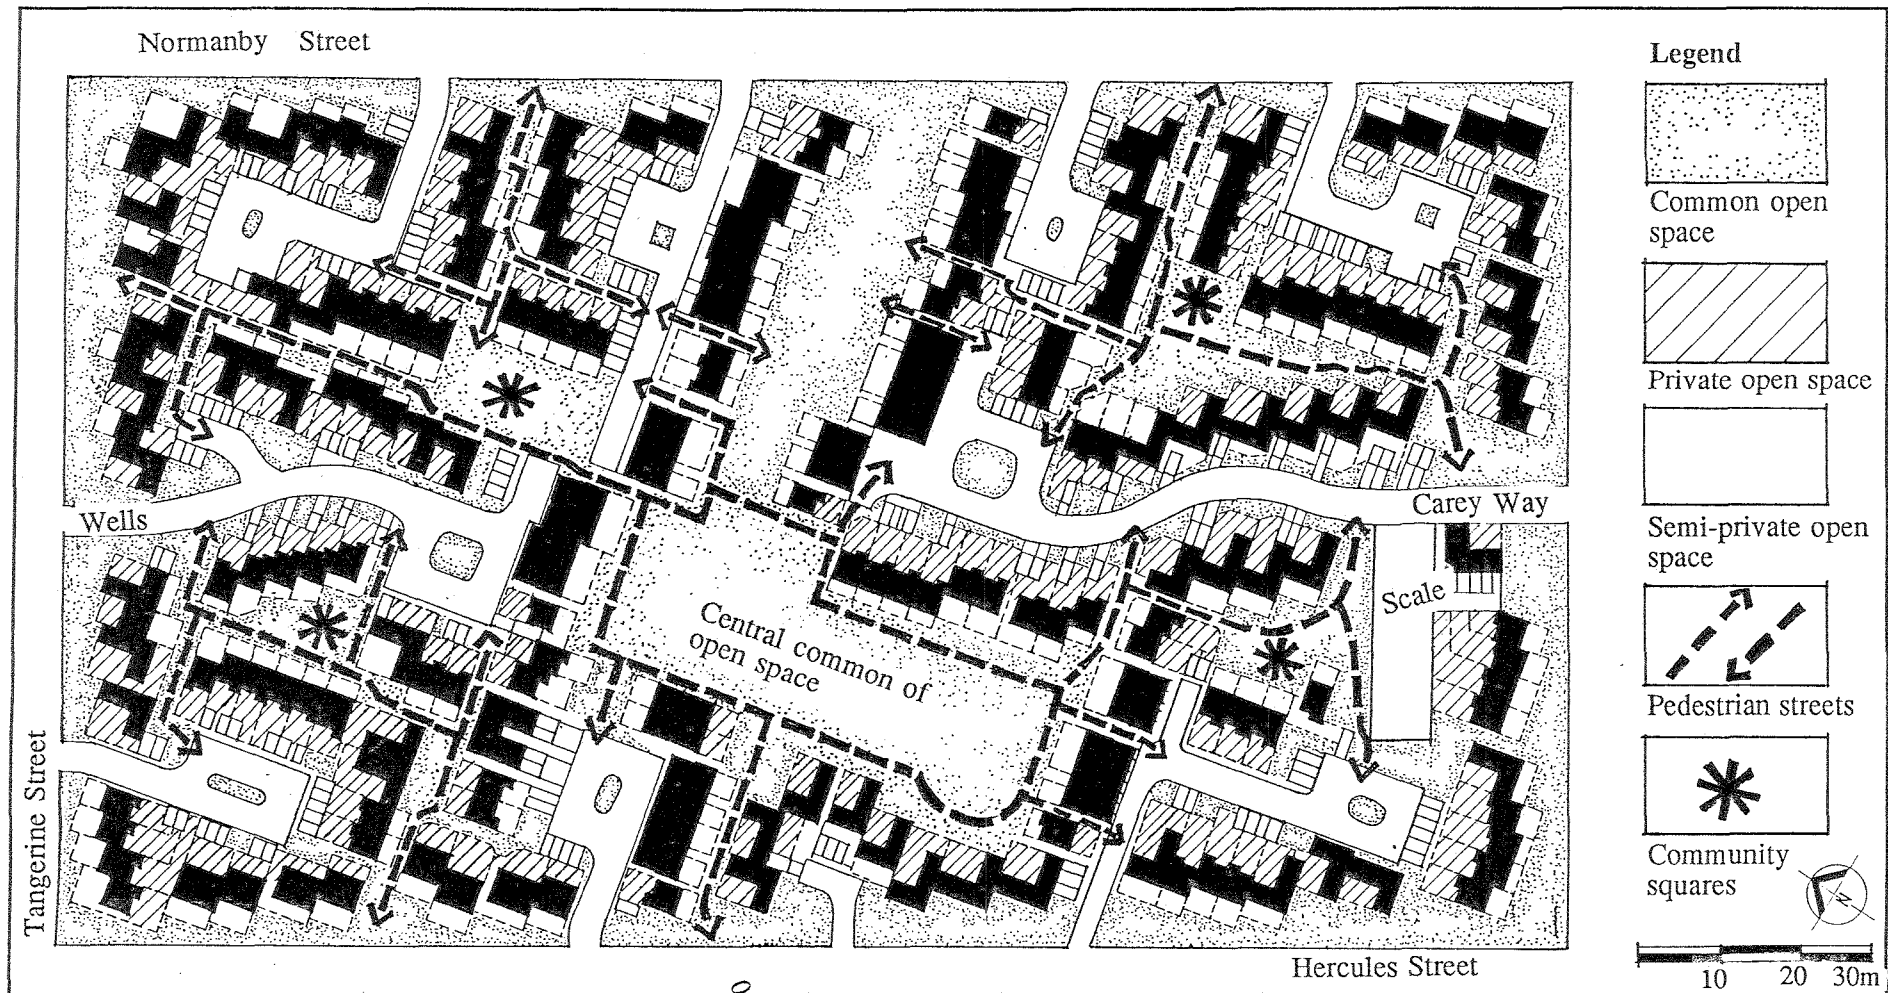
Master plan for Villawood, a Low Rise Urban housing development incorporating 253 two, three and four bedroom dwellings
